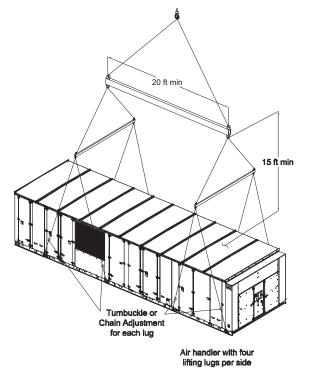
Typical unit rigging—air handler with four lifting lugs per side
